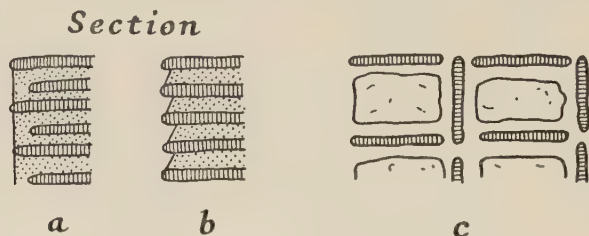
SECTIONS OF TOWER WALLS, NICAËA
